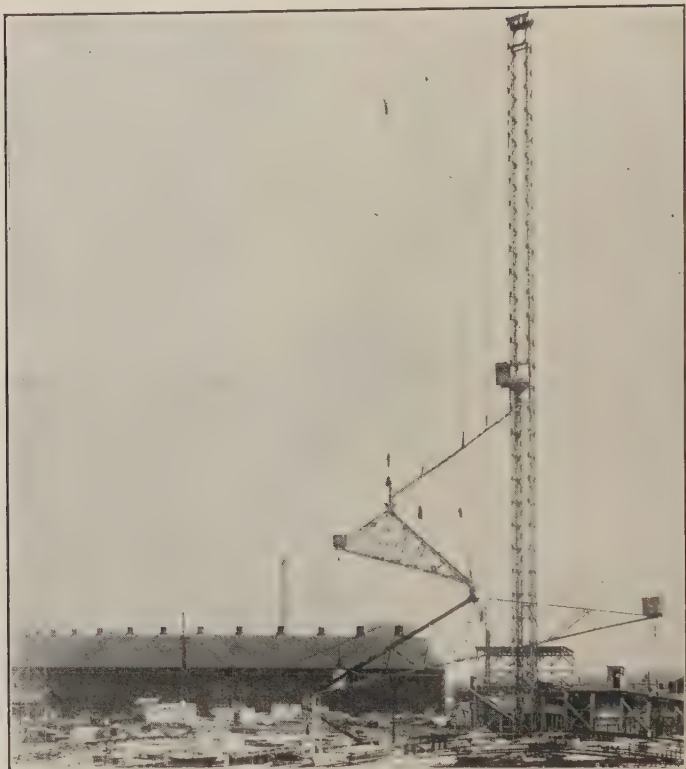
View showing a 240-ft. tower and chutes for distribution of concrete.
